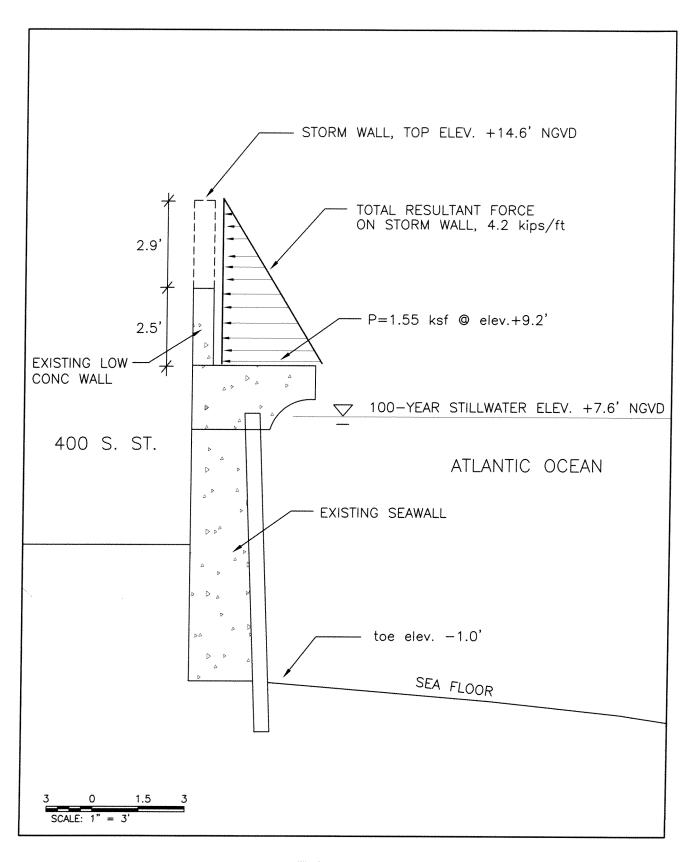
STORM WAVE LOADING ON STORM WALL
